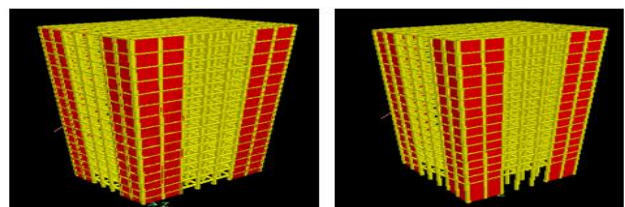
Building with L shape shear wall on plain and sloping ground.
